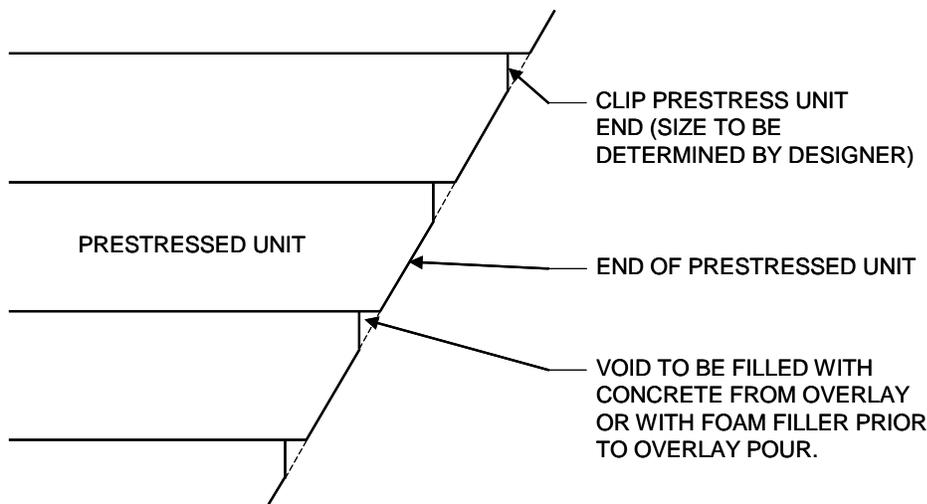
1 Clip detail for skews greater than 30°
